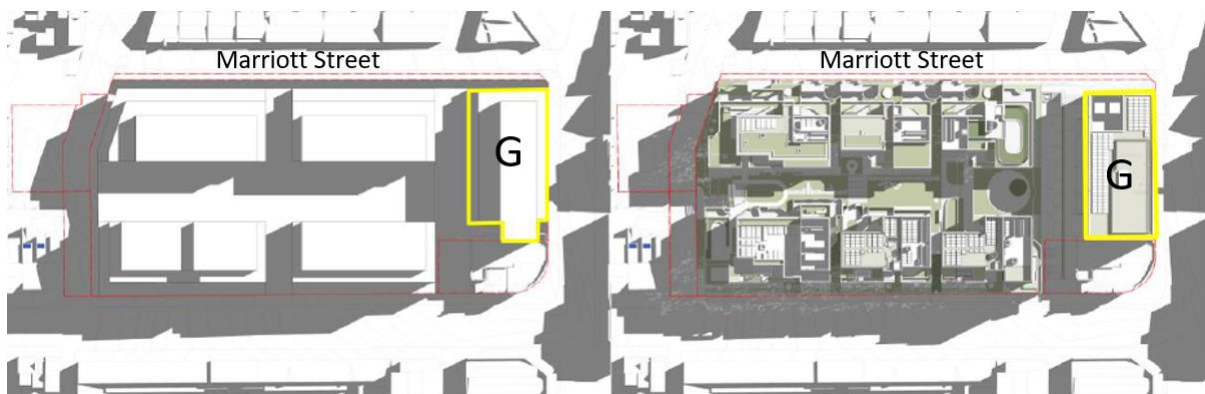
Building G DCP envelope (left) and Building G proposed (right) at 1:00pm, winter solstice.
